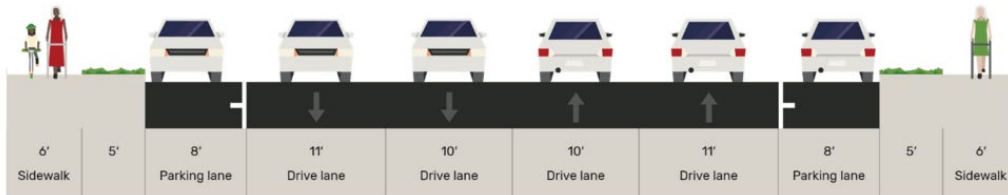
Section B (13th to 17th) – Existing (58' curb to curb)
